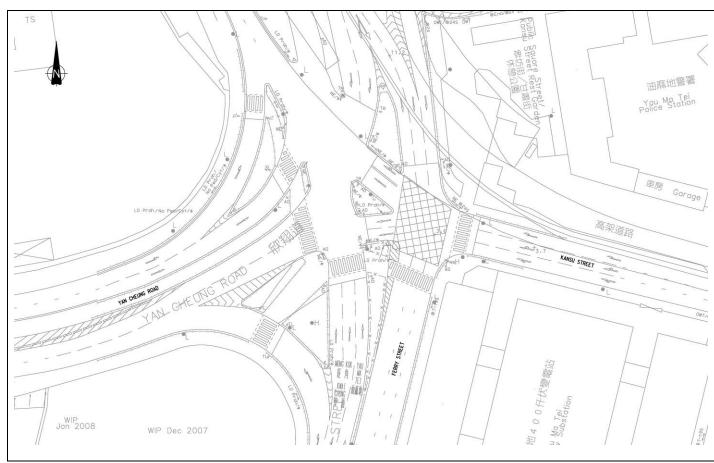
Existing Junction Layout of Yan Cheung Road/Ferry Street/Kansu Street (J5)
